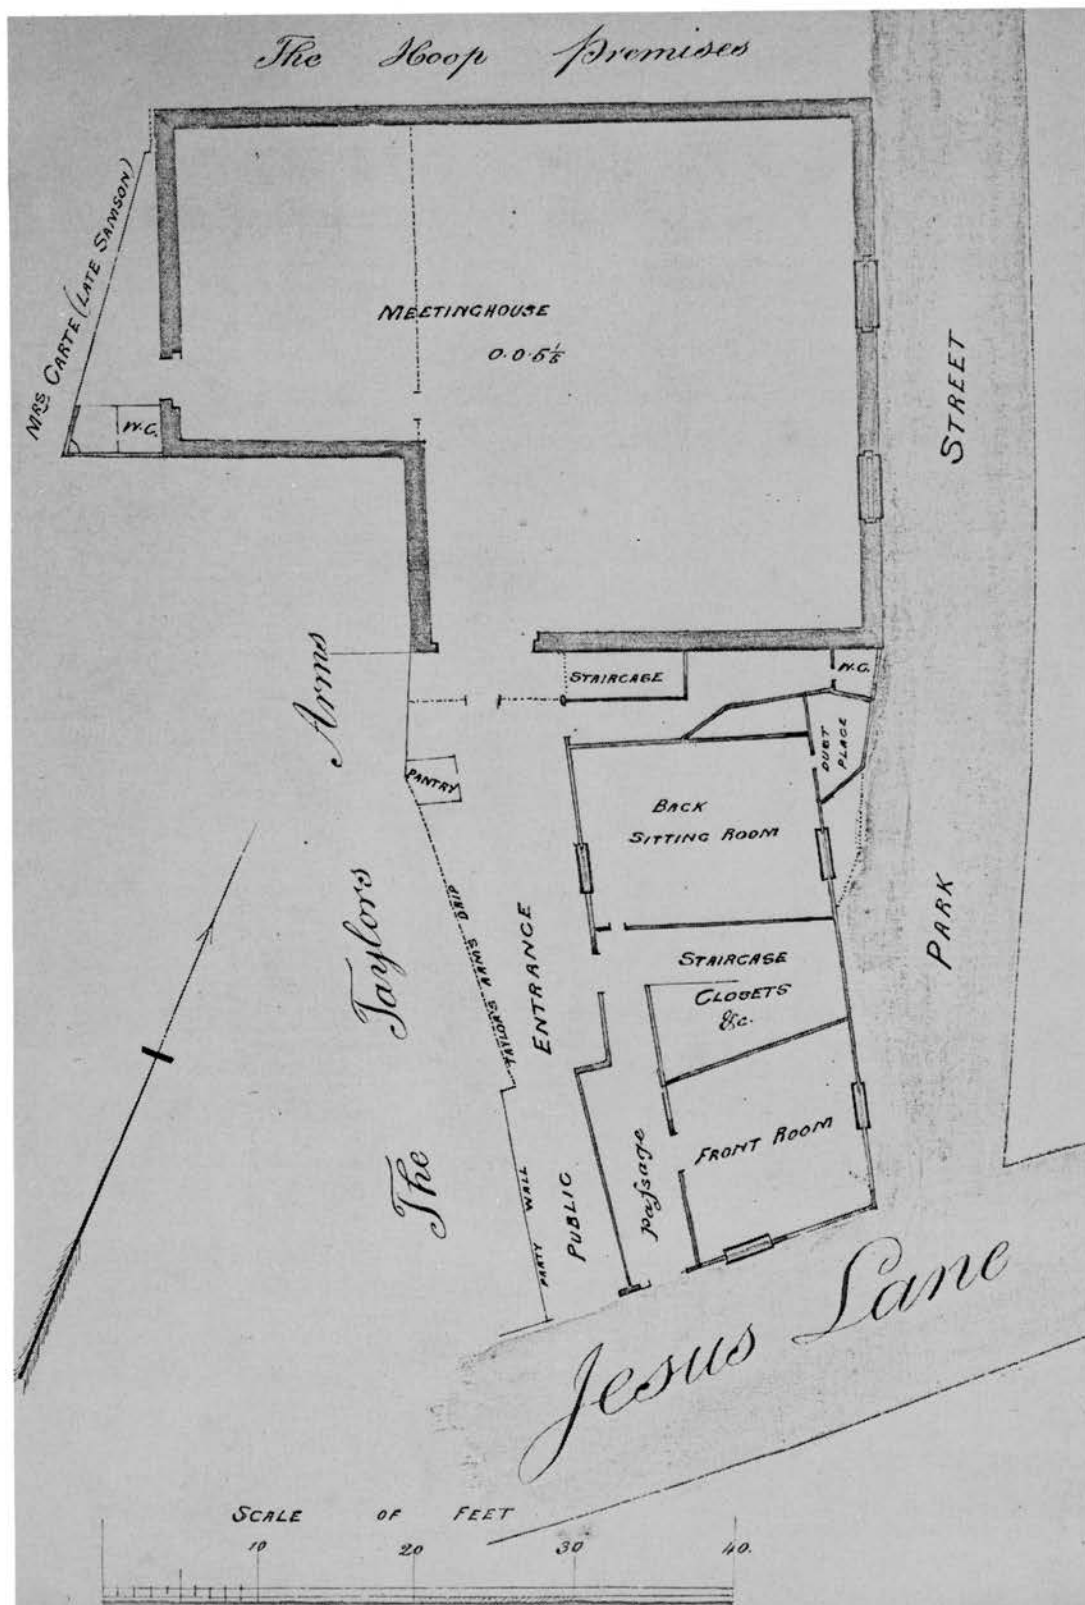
Plan of the meeting house and cottage ground floor in about 1870. A staircase led to galleries along the south and east sides of the meeting room.
